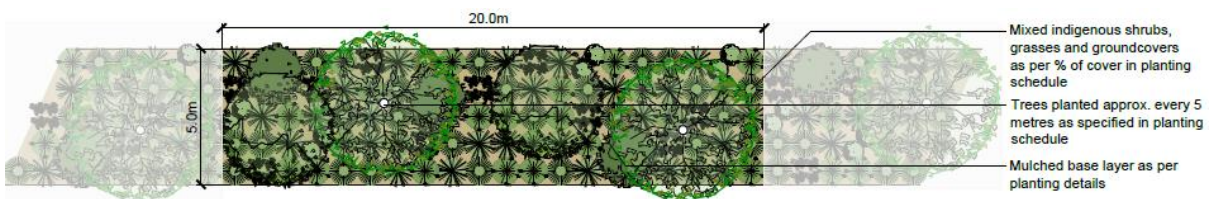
Typical 5 metre Buffer Planting Layout
